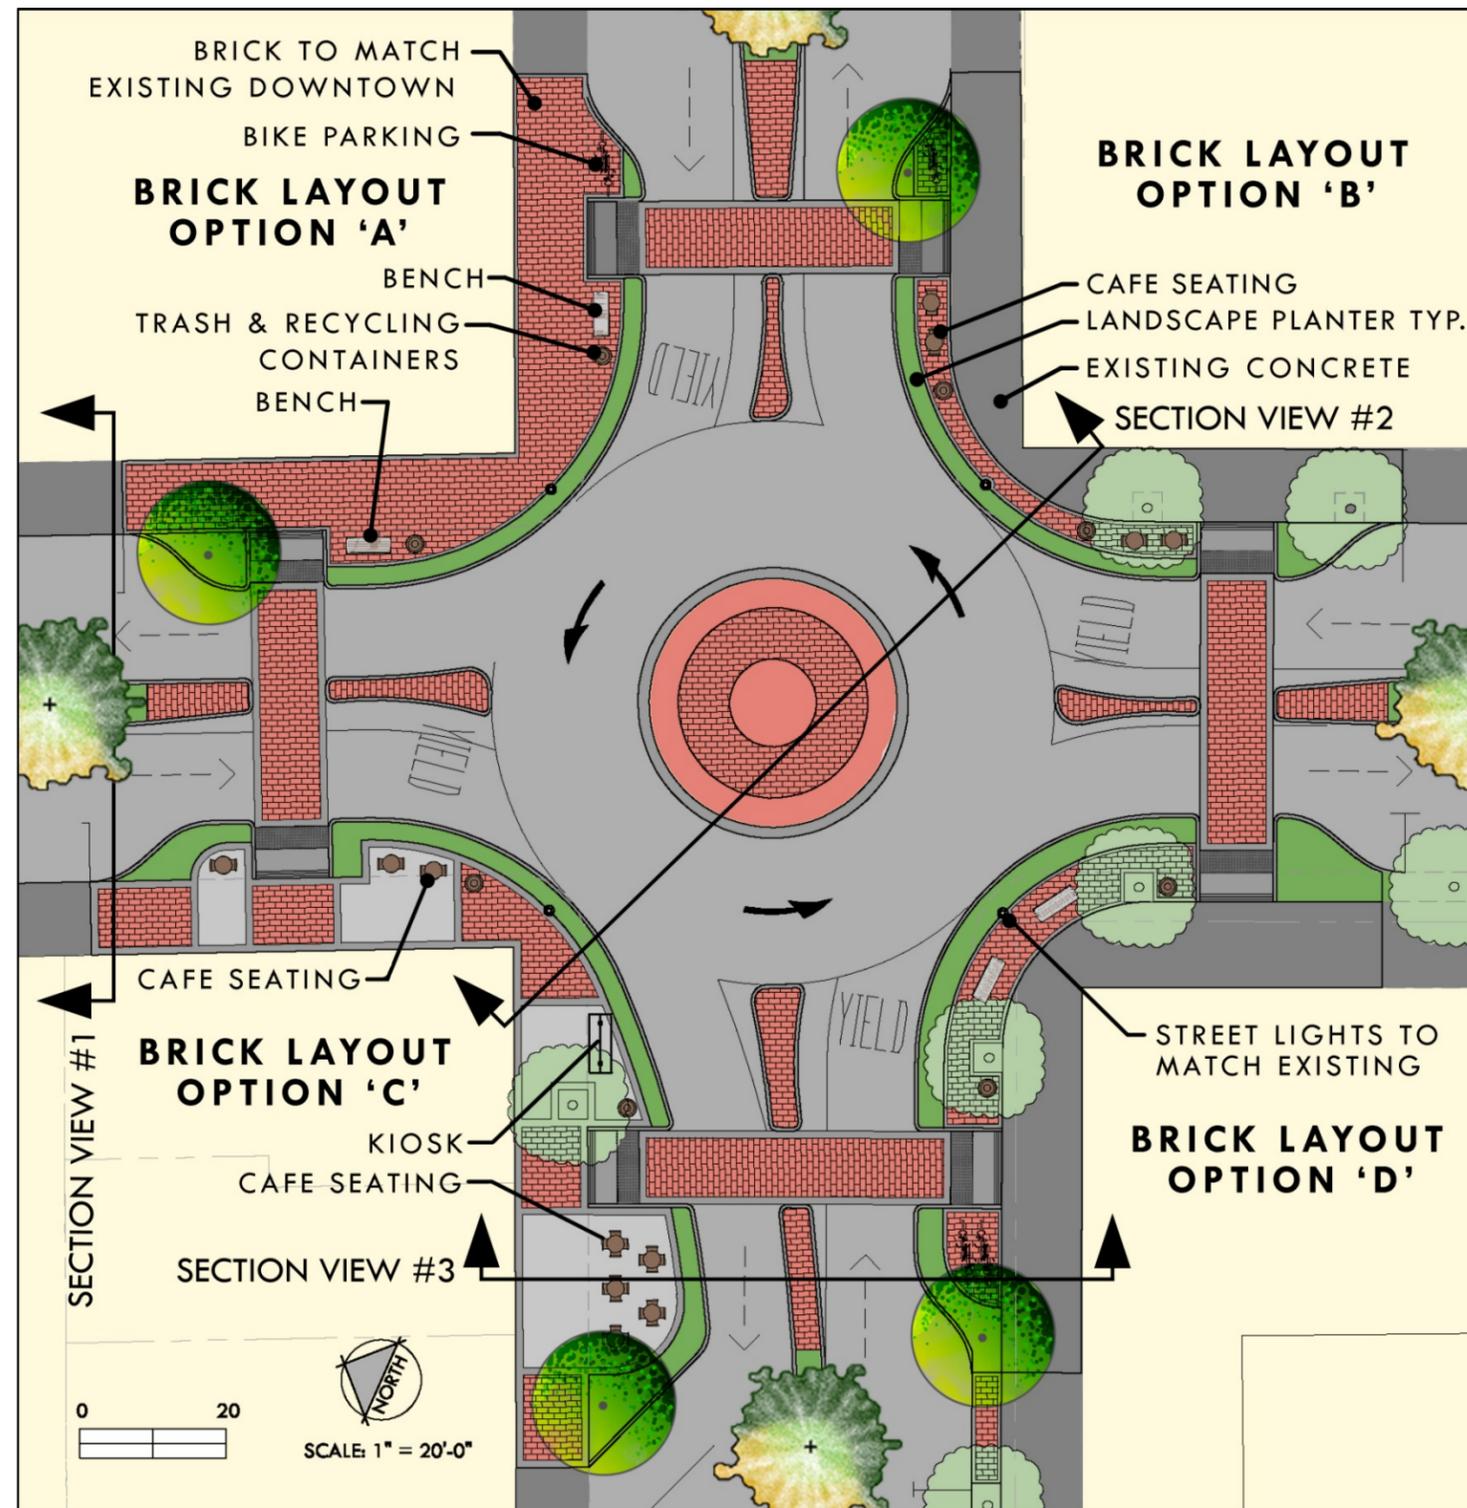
Mini Roundabout - Streetscape Concept Plan
